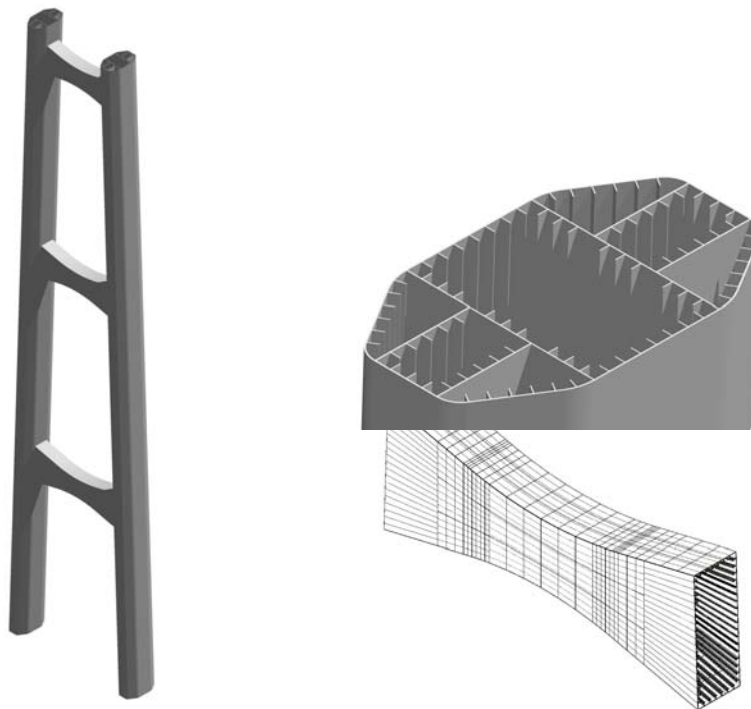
Messina Strait Bridge, geometry model and cross section of the Tower and Cross girders.
